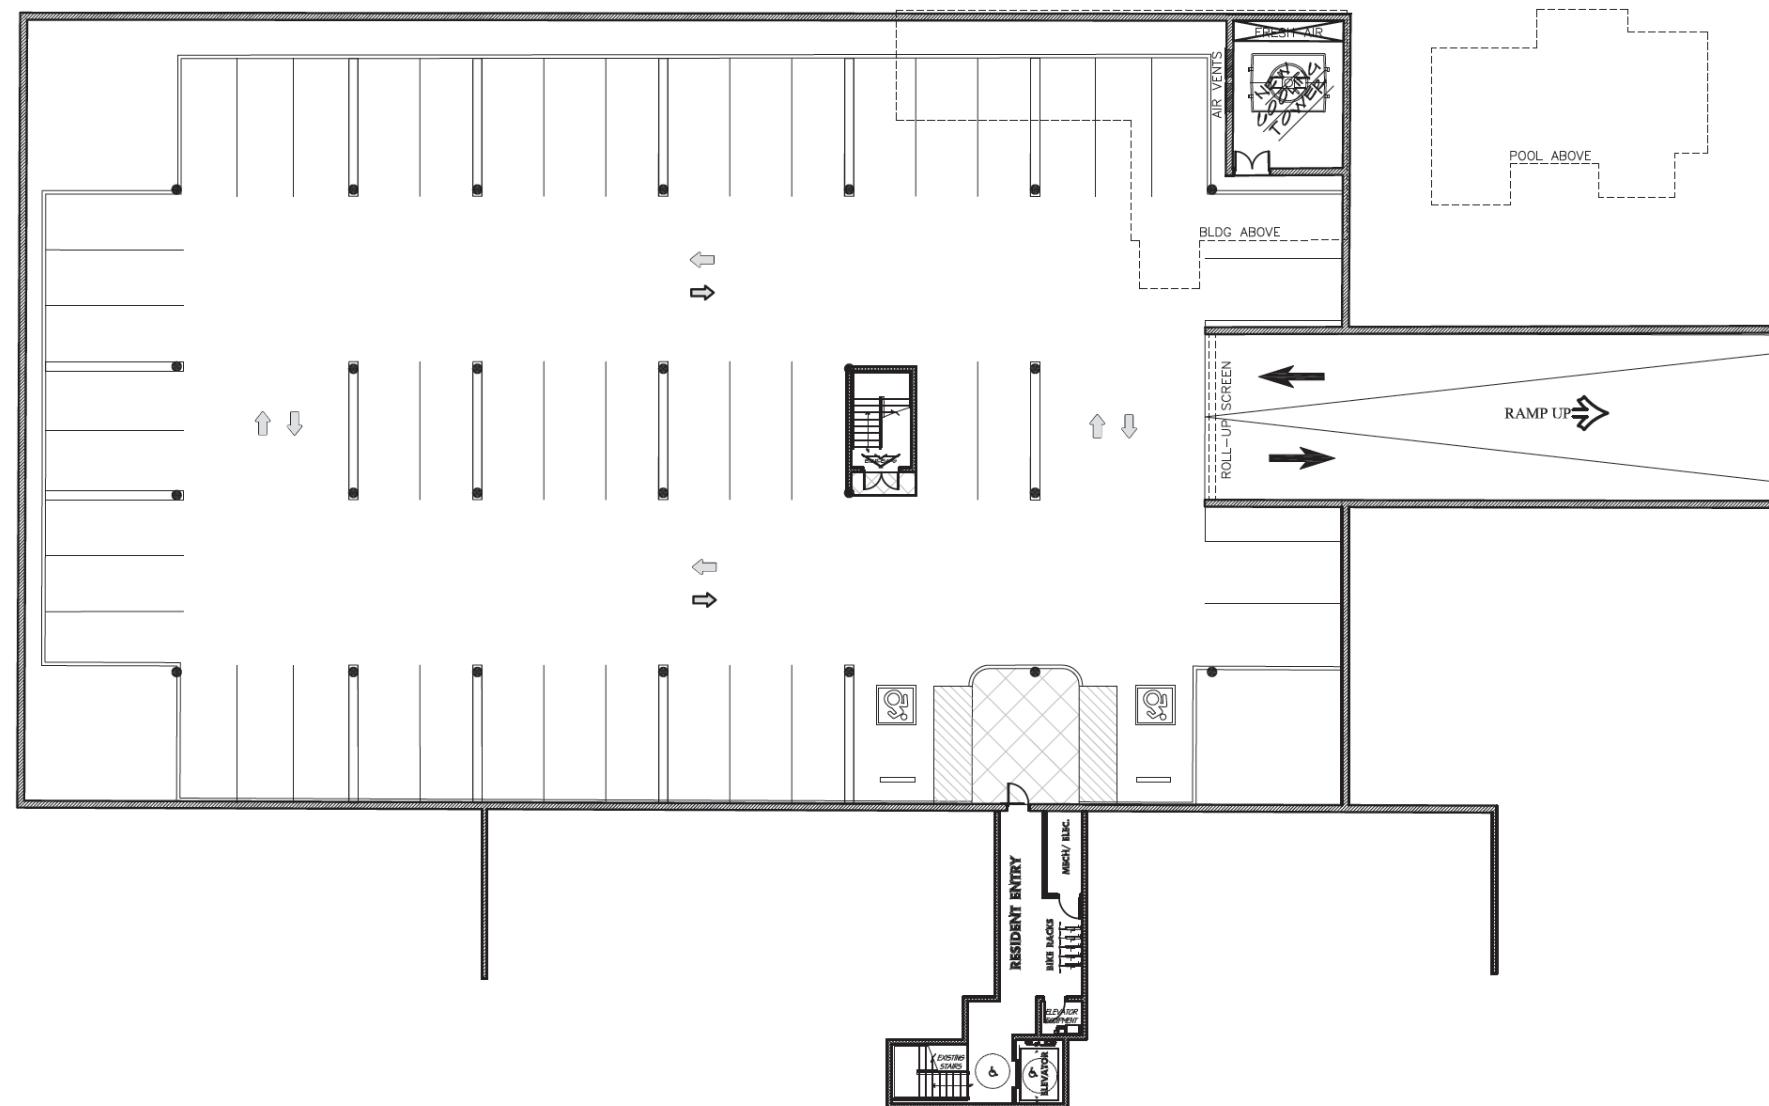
DEVELOPMENT / CONCEPTUAL SITE PLAN
